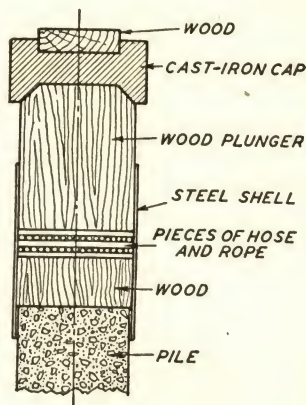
A. Cushion Head for Driving Reinforced Concrete Piles
